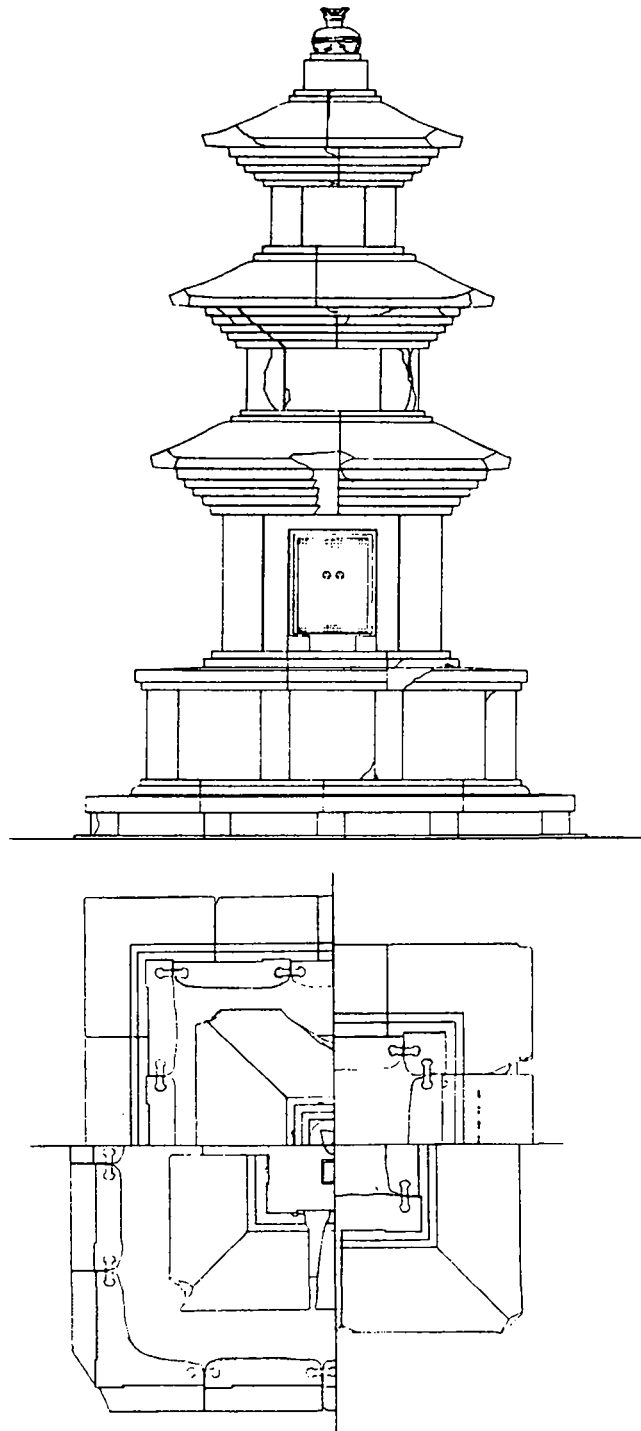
Six partial plans and elevation of the stone pagoda of Ko-sŏn-sa 高仙寺 고선사 (late 7th C. AD, scale: 1 : 100) (after: MHCKLG (1977), pl. 41, 44)
